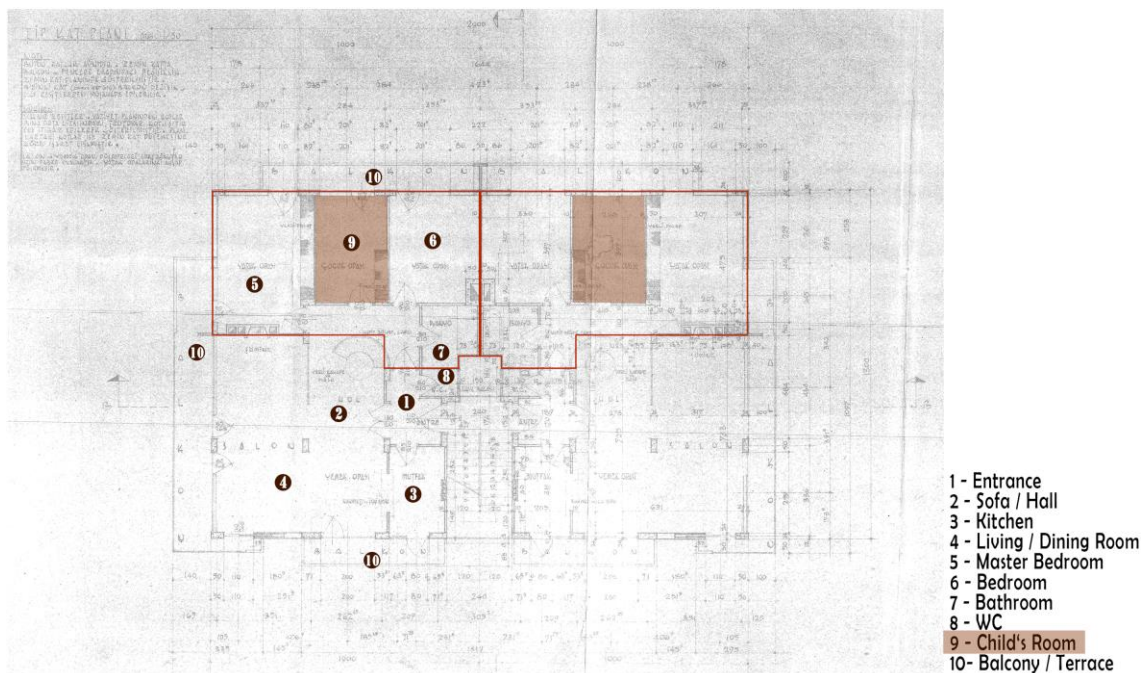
The regular floor plan of Murat Apartment, Ankara (Source: VEKAM, SMB171_plan_03)
